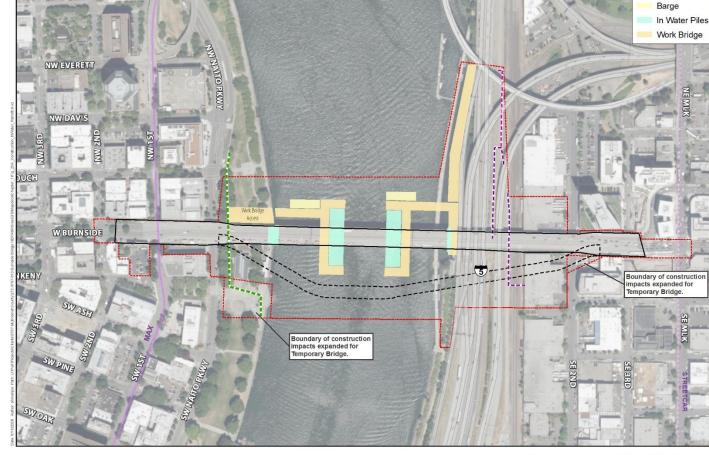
Construction Access and In-Water Work – Retrofit Alternative
